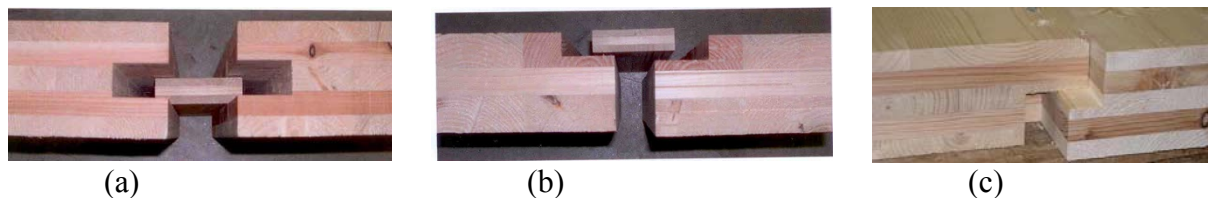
Three different step joints between vertical wall panels; (a) a cross-layer stripe inserted into internal grooves, (b) a cross-layer stripe inserted in grooves on the internal side of the wall, and (c) a half-lap joint
